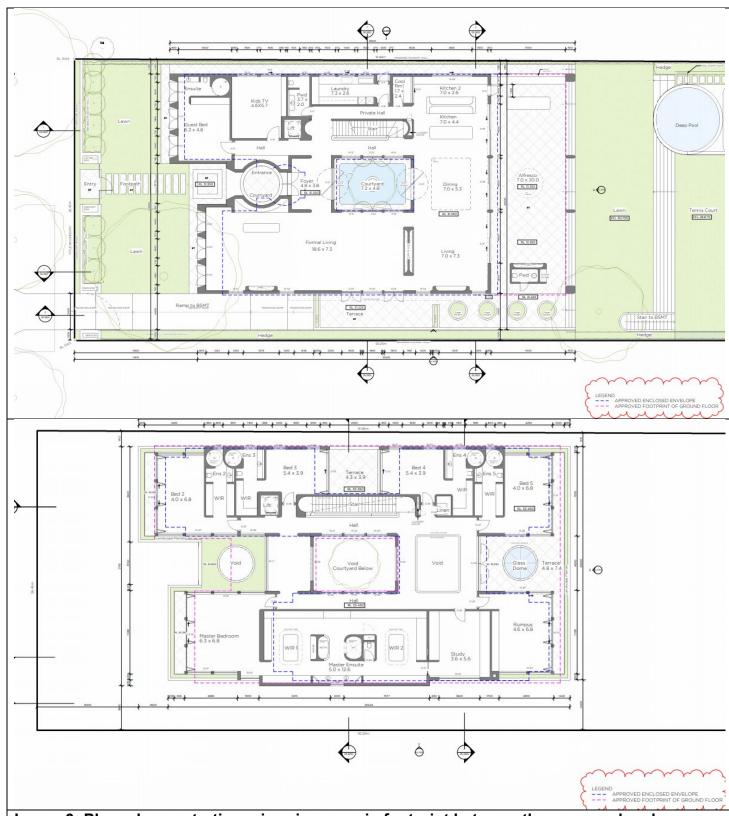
Plans demonstrating minor increase in footprint between the approved and modified plans.
